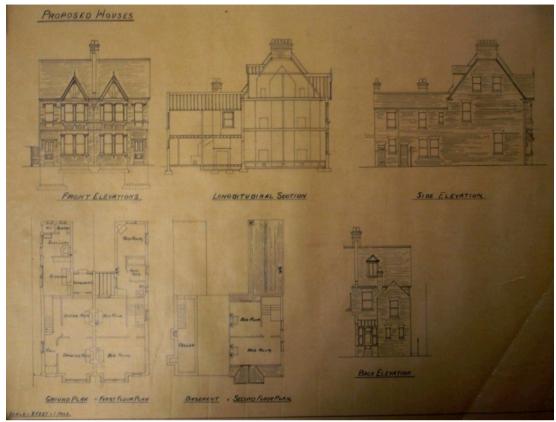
One of the generic drawings in the Norfolk & Prior collection. The design is not related to a particular street. The floorplans are slightly unusual with attic rooms and flank wall windows. This type of street façade, however, with its square bay windows was very popular all over London in the Edwardian period.
